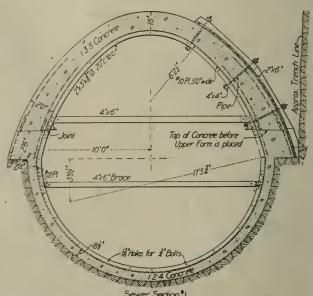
SECTION OF O. K. CREEK REINFORCED CON-CRETE SEWER, KANSAS CITY, MO.
